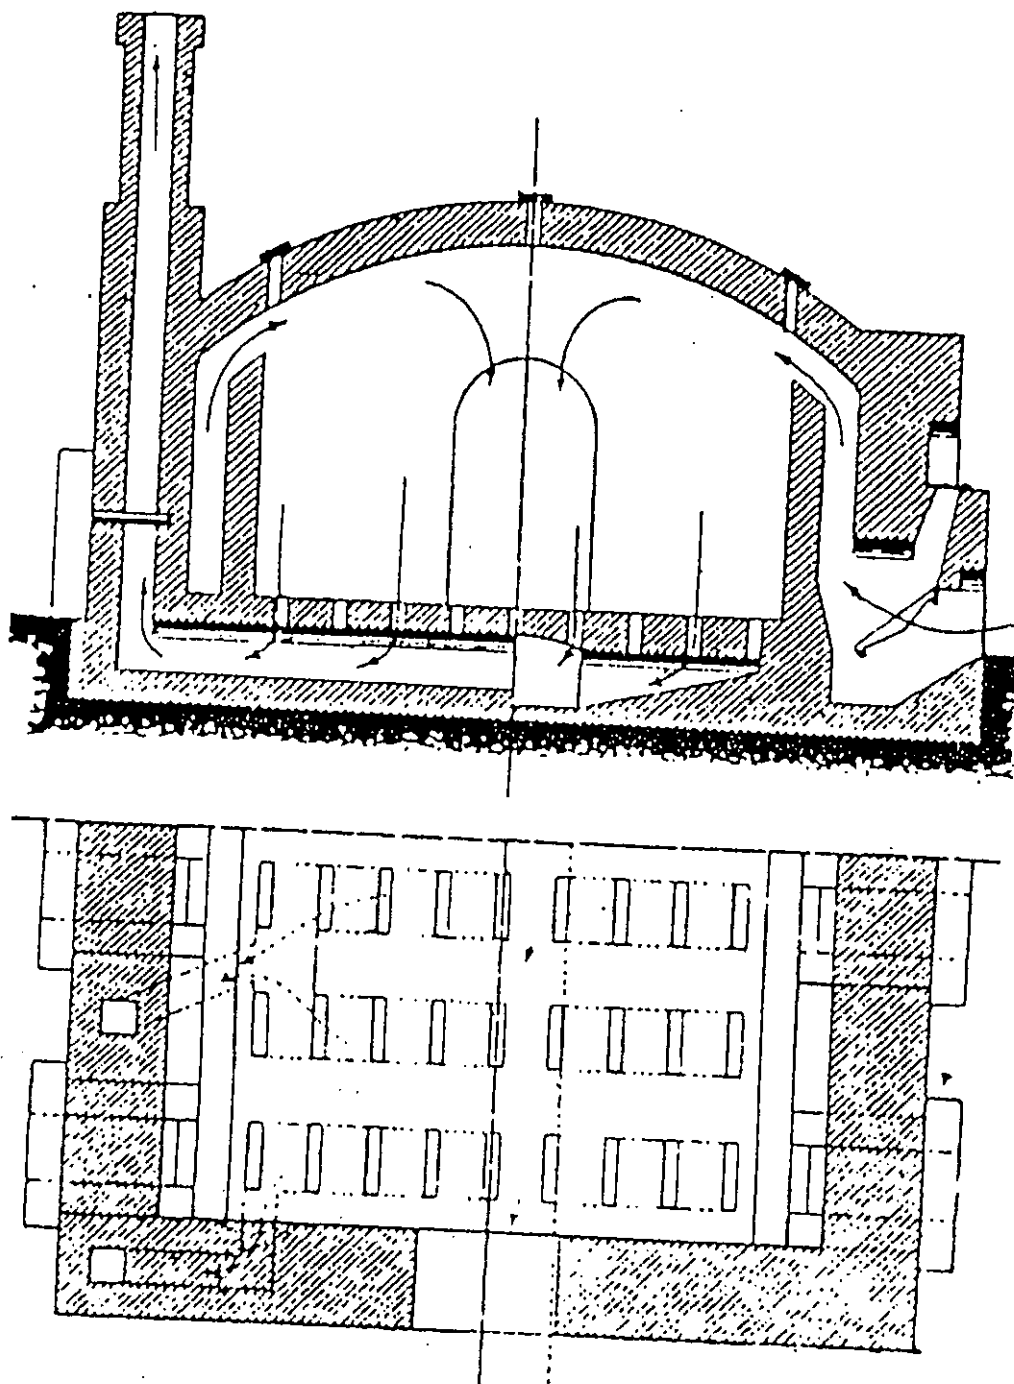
PLATE IV: Rectangular down draught kiln, a very similar type to the 'beehive' kiln.
